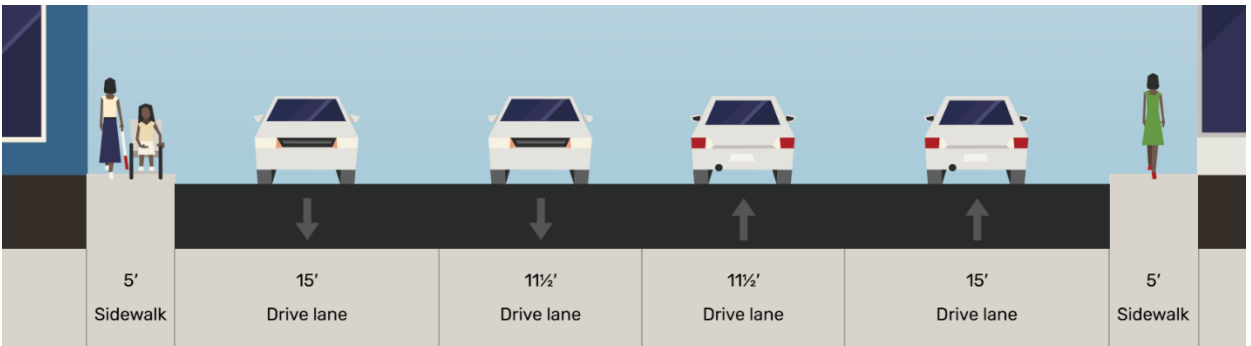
EXISTING TYPICAL SECTION (22ND ST TO 20TH ST)
